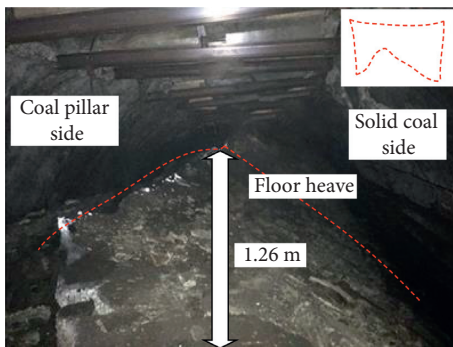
Floor heave of return airway in no. 130203 working face.
